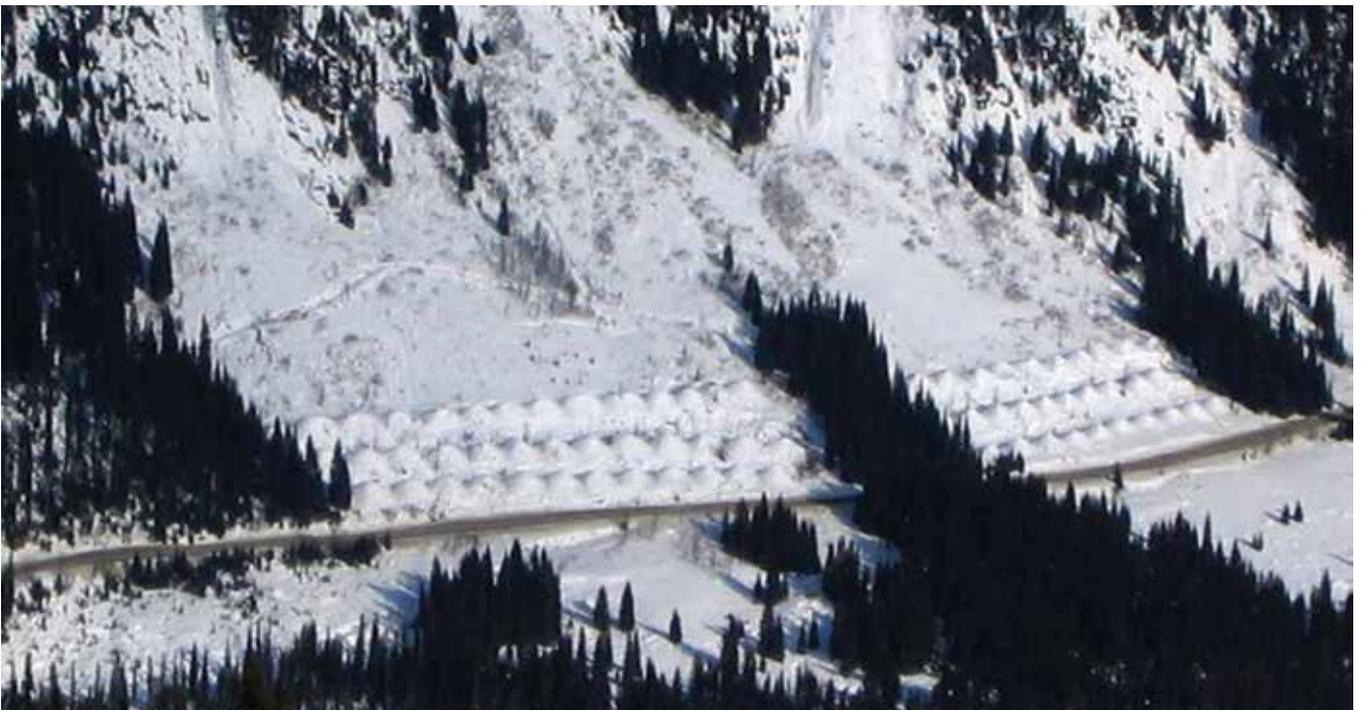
Example of retarding mounds in the runout zones of three avalanche paths in the Rohr Ridge area, located on the Duffey Lake Road (Hwy 99) east of Pemberton, BC. B. Gould photo.
